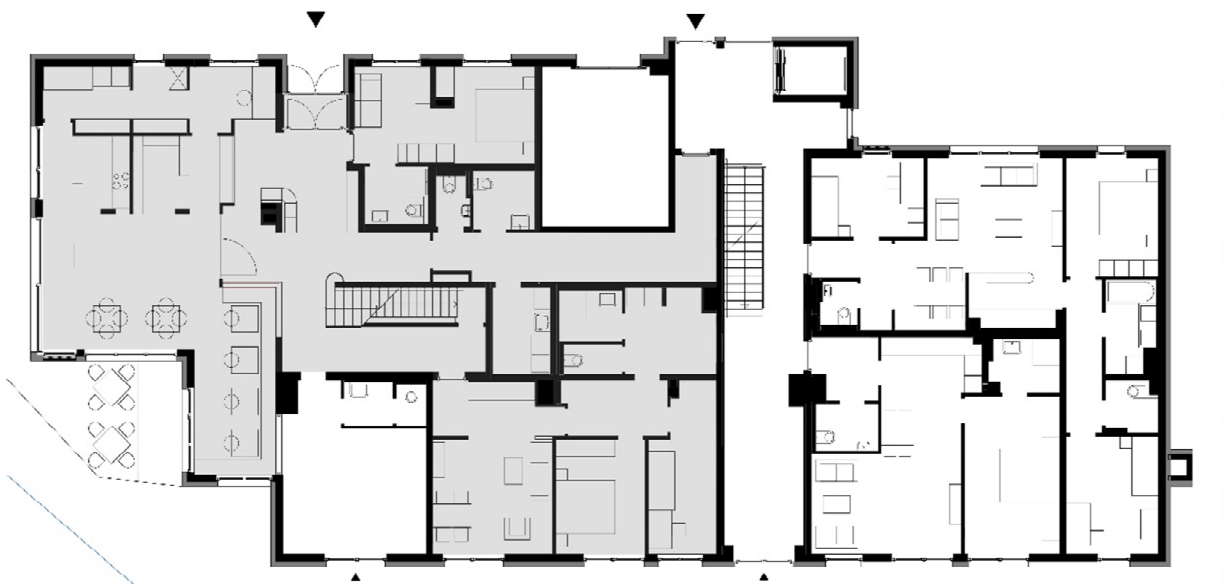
Pegasus. Floor Plan Ground Floor (own ill. after architect's floor plans)
